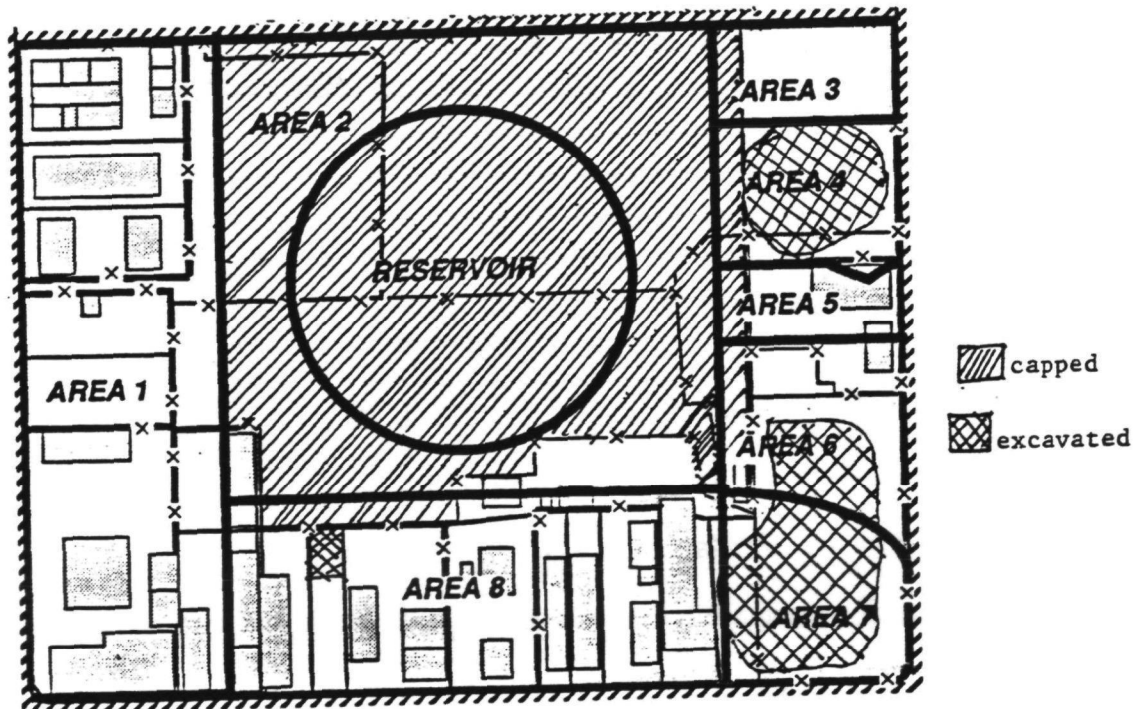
Areas to be Excavated and Capped for Alternatives 3C and 3D
